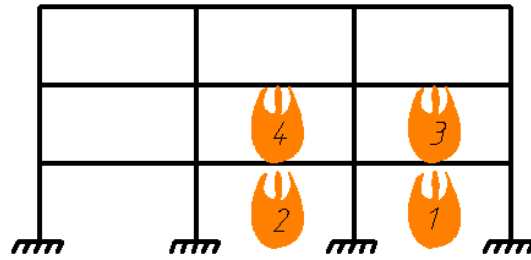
Accepted scenarios of calculated fire: a - lower floor - outside span, b - lower floor - middle span, c - middle floor – outside span, d - middle floor - middle span
